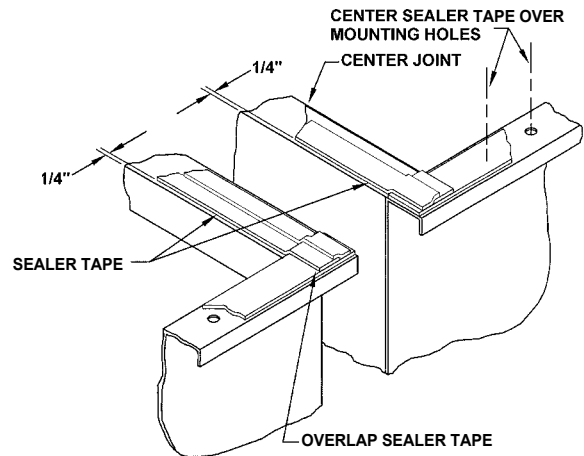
Sealer Tape Detail for Center Joint of Units with four Top Sections.
